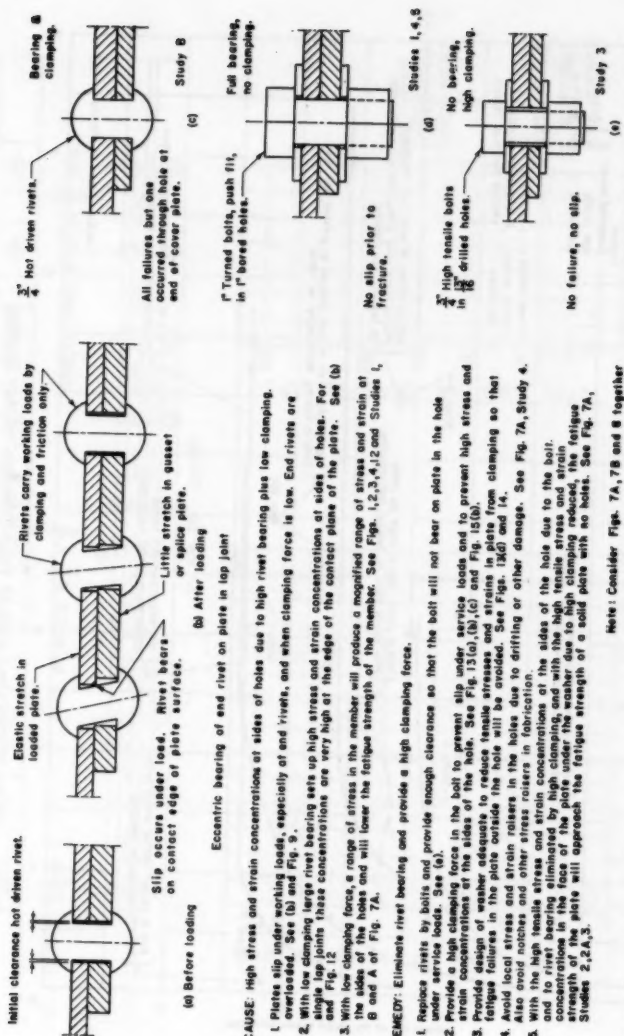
B—CAUSES OF AND REMEDIES FOR FATIGUE FAILURE IN RIVETED AND BOLTED SINGLE LAP JOINTS
